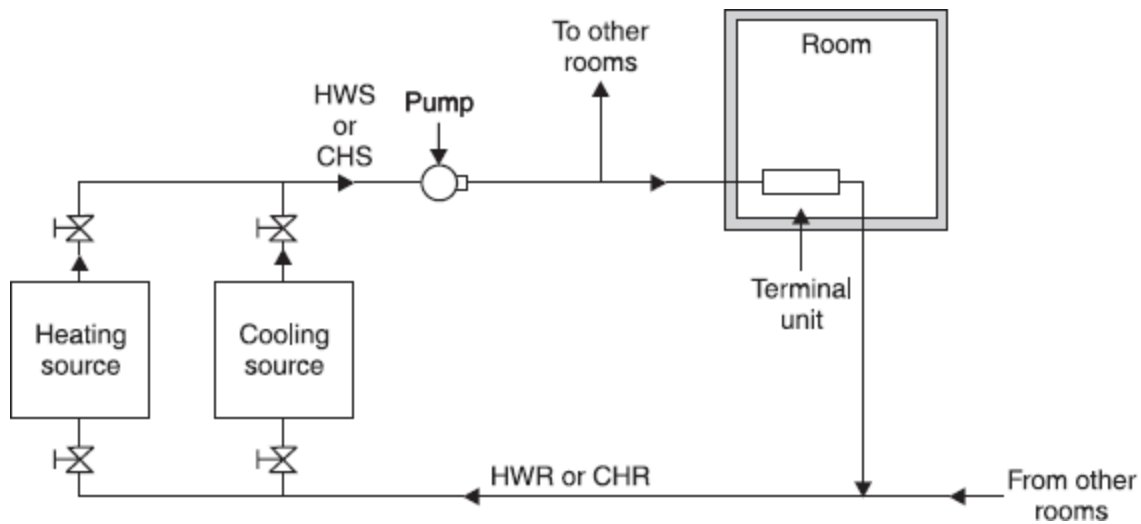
Arrangement of basic components of a hydronic heating and cooling system
